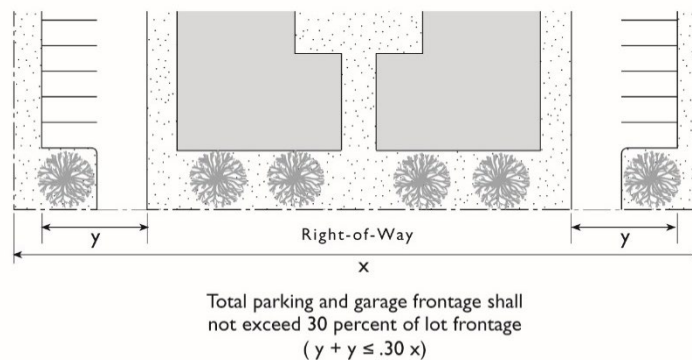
B(2): PARKING AND GARAGE FRONTAGE LIMITATION
